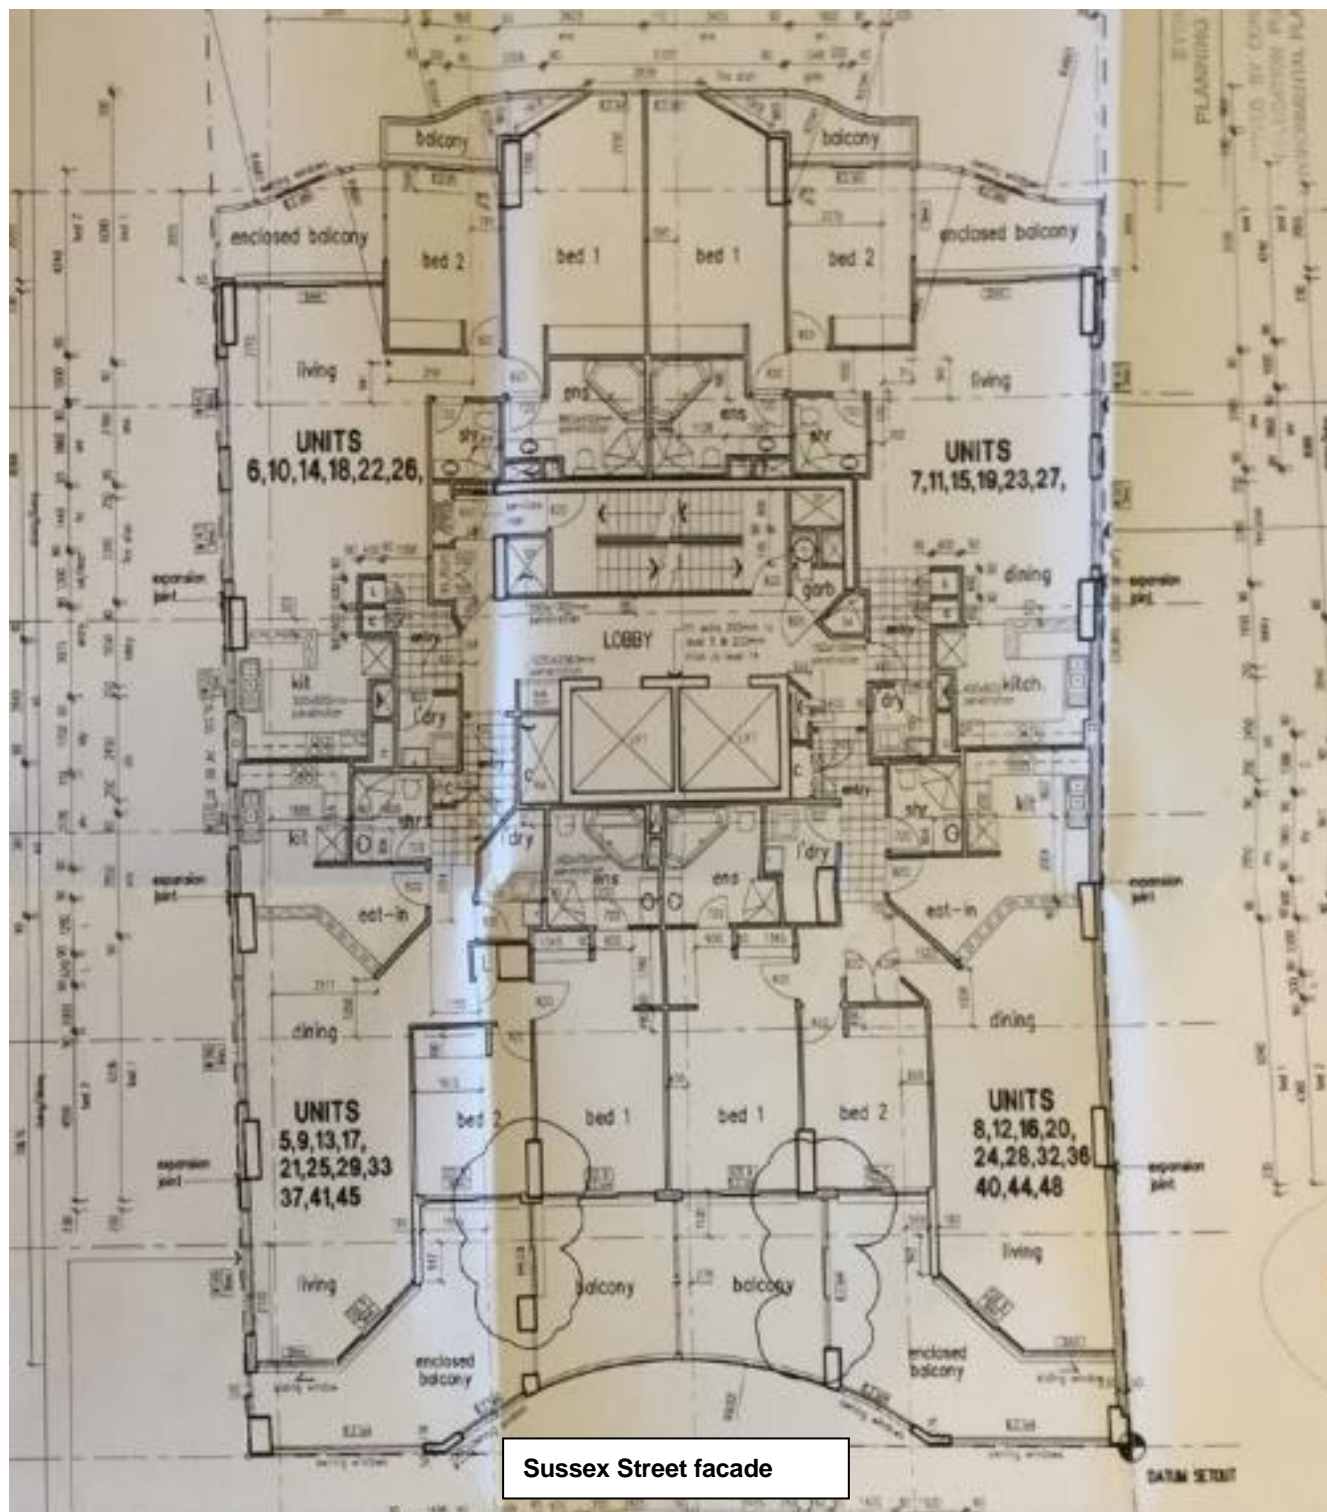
Level 3 – Level 14 Floor Plan (Astoria)
